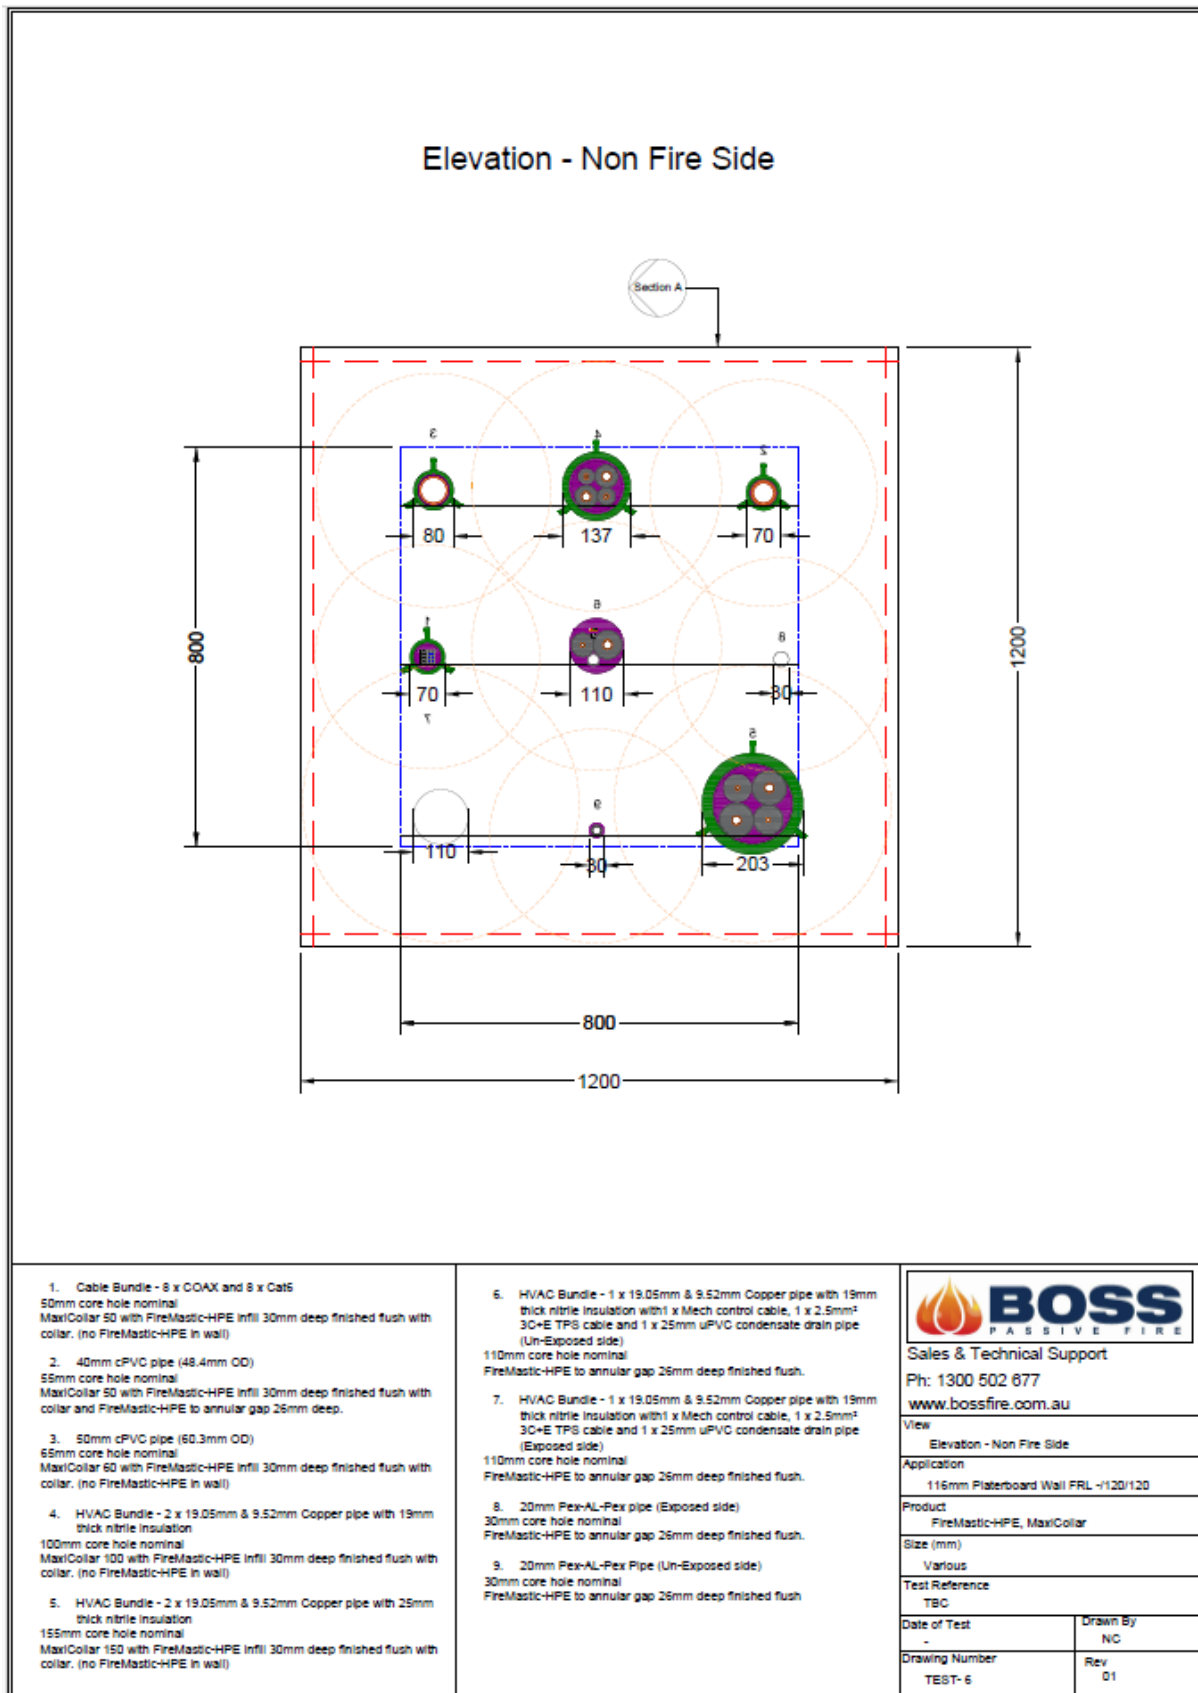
Test 6 – Elevation – Non Fire Side.pdf
